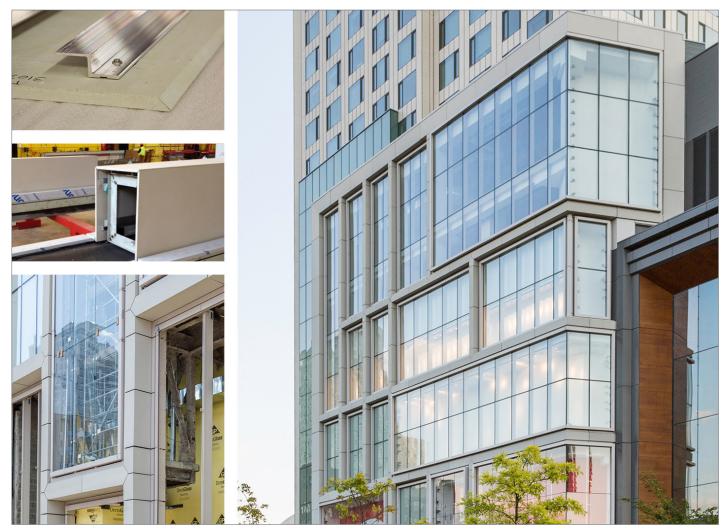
A\UHPC cladding a Unitized BVDC integrated with glazing system. This example from a multi-use retail and residential complex in New York responds to the architects' desire for more expression of architectural depth on the facade of the building than the layers of the wall actually require.
